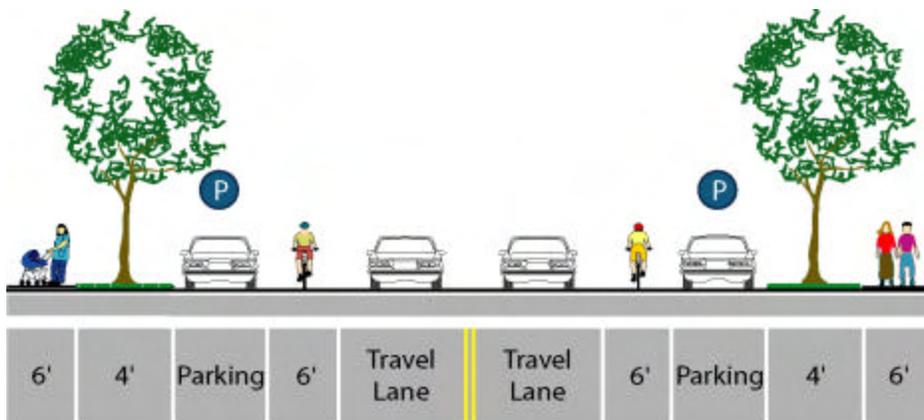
Two Lane Road with 4' Minimum Planter Strip
